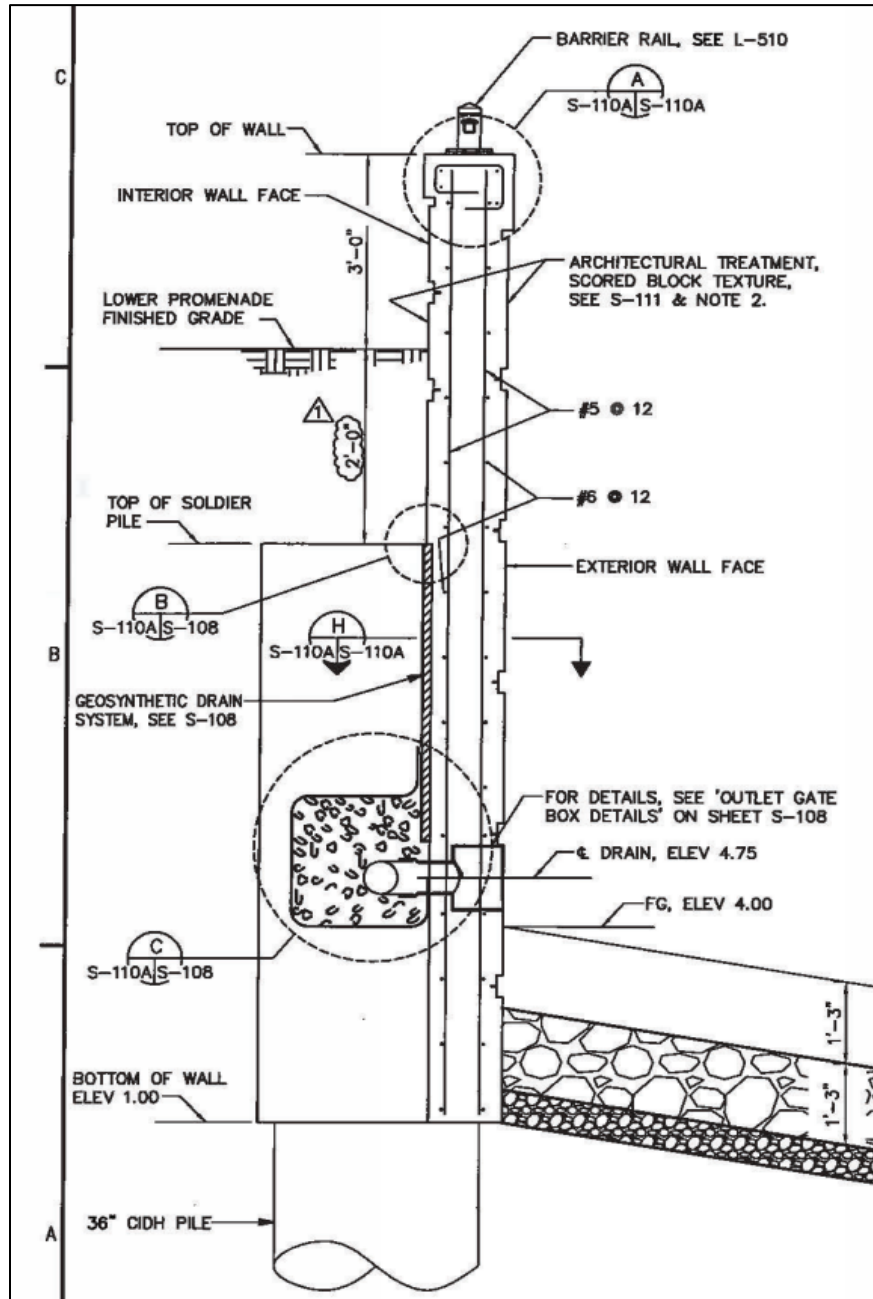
Typical Cross-Section (Type C Modified) of the Floodwall
